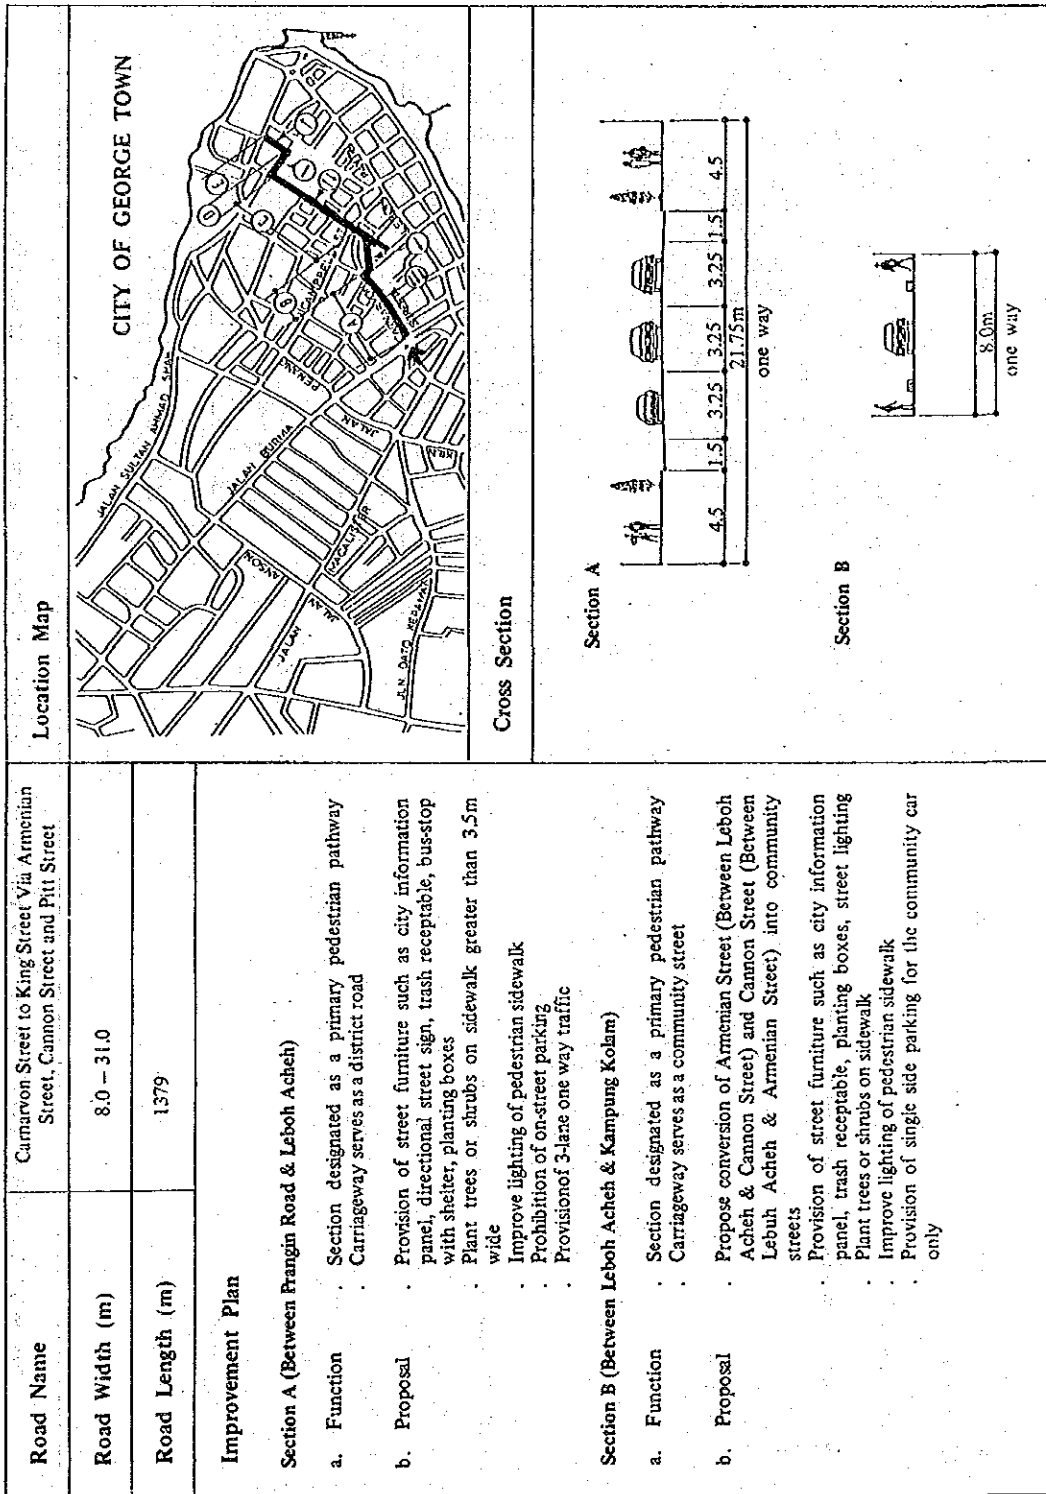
Pedestrianisation Improvement Plan (6) – Carnarvon St. to King St. Via Armenian St., Cannon St. & Pitt St.
